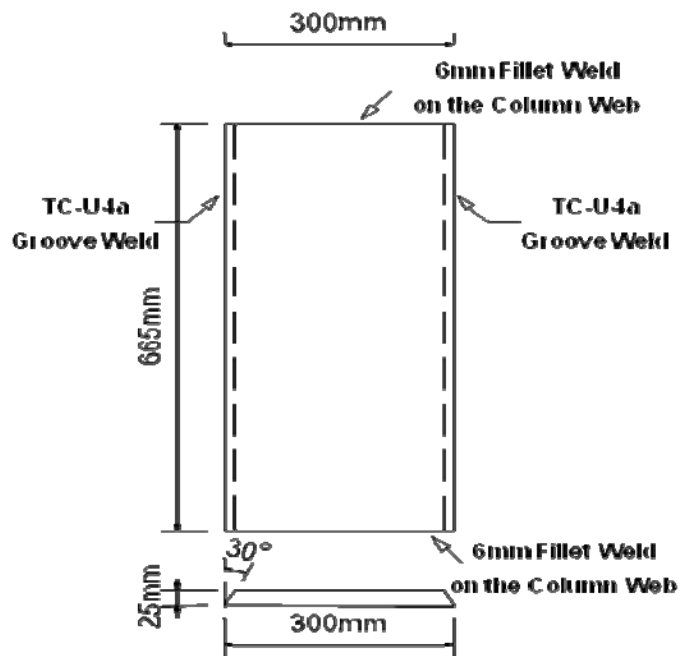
Dimensions of Doubler Plate and Welds
